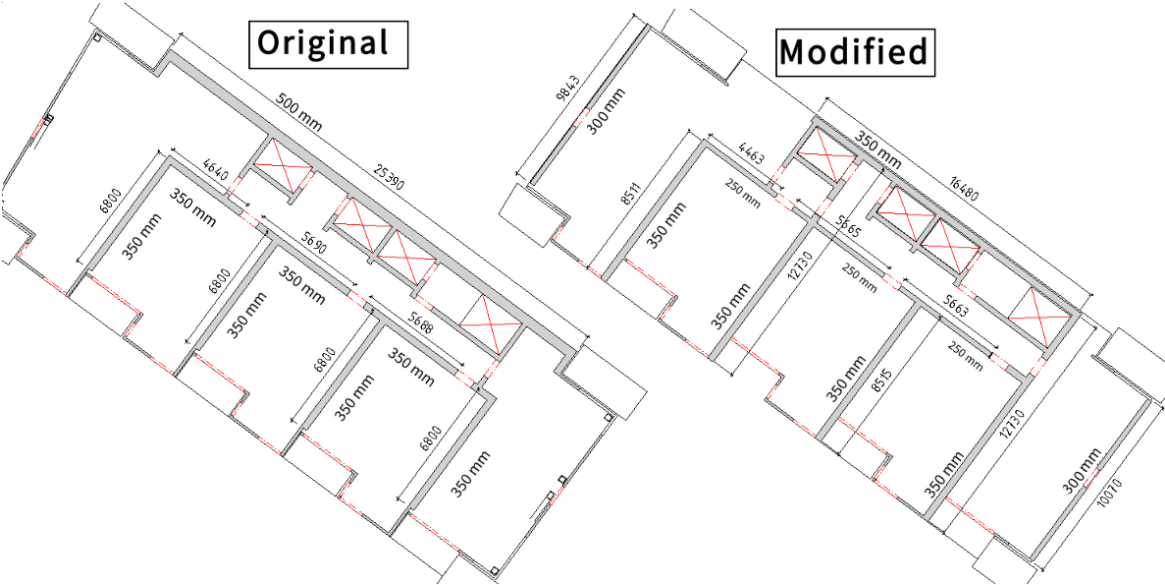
Original and modified plan drawing where shear wall dimensions are displayed for both configurations.
